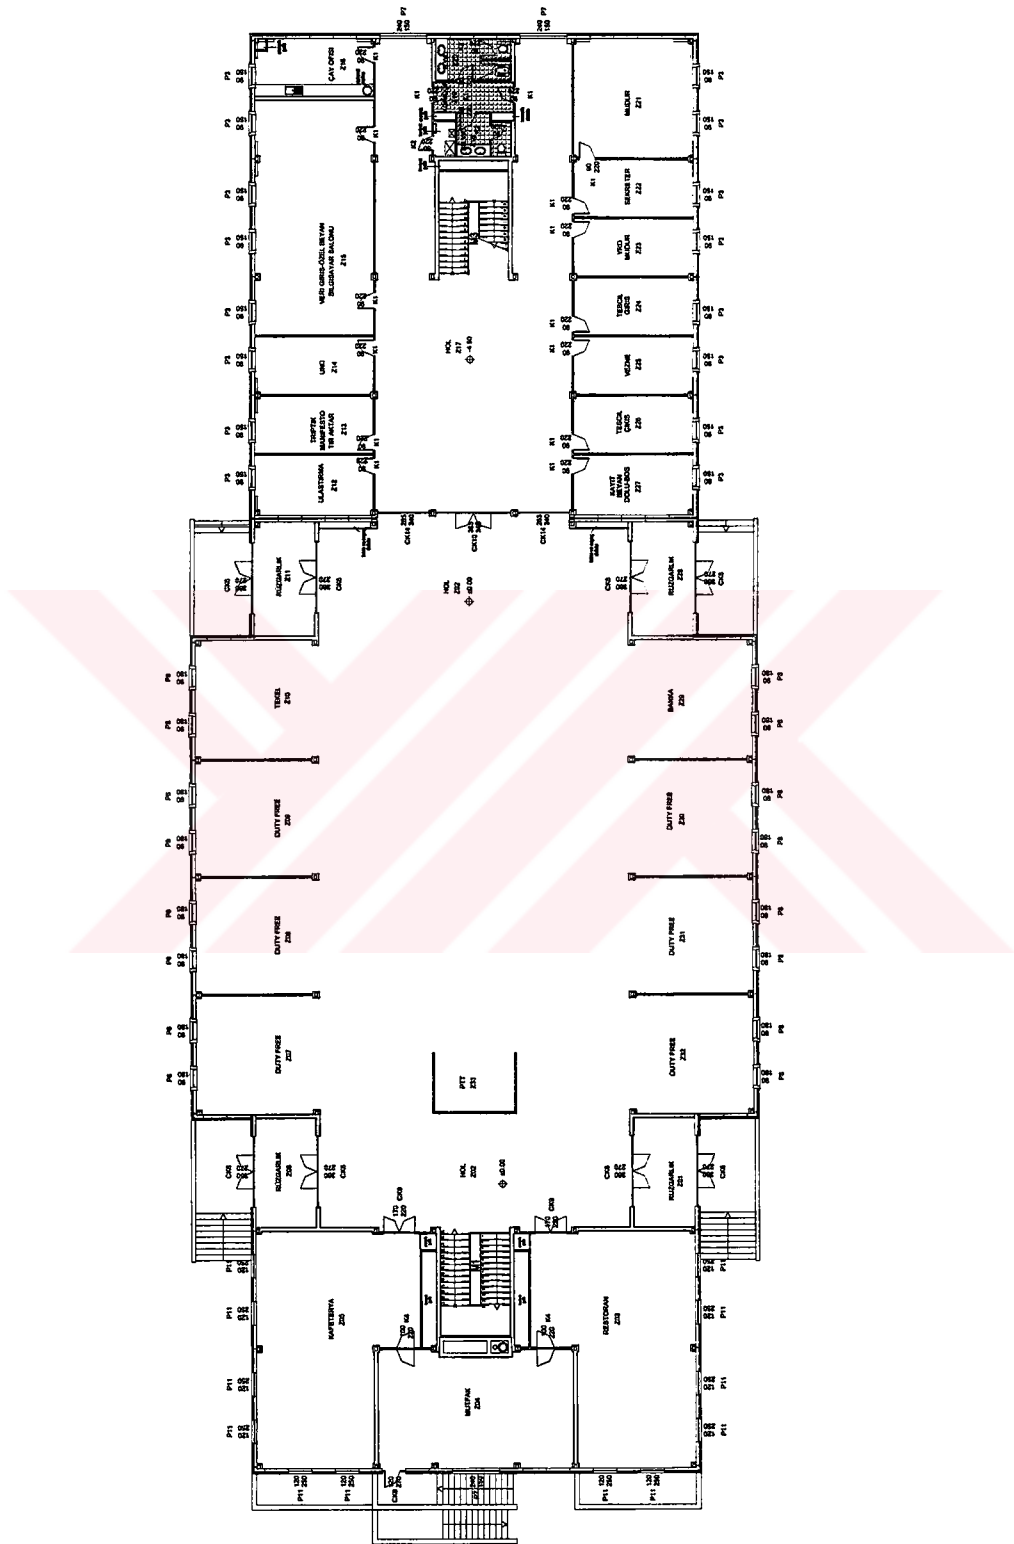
Ground Floor Plan of Gürbulak Customs Building (Courtesy of TEPE Construction Co., 2002)
